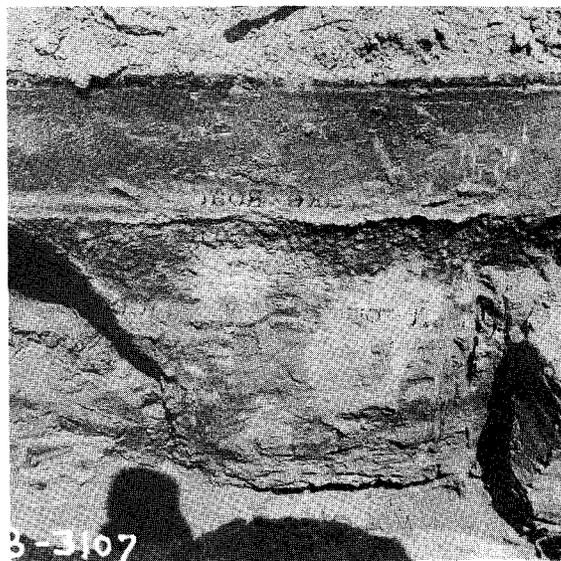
Edge view of lug and anchor slab looking into the trench. Camp Strake Road Overpass.
